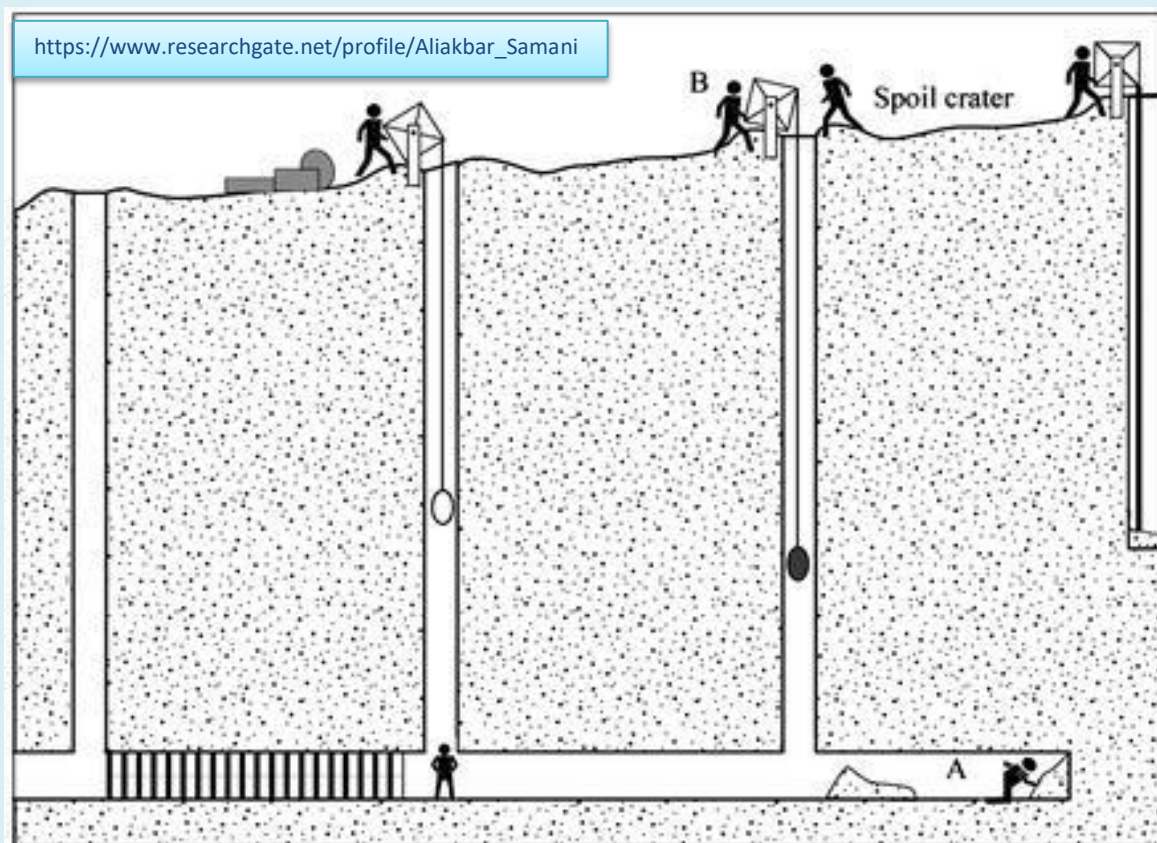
Schematic diagram showing the construction of the underground section of a qanat
